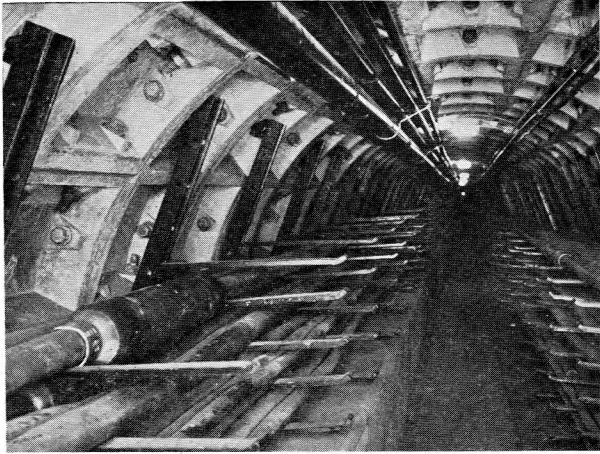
TYPICAL VIEW OF REINFORCED CONCRETE POST OFFICE CABLE TUNNEL.
